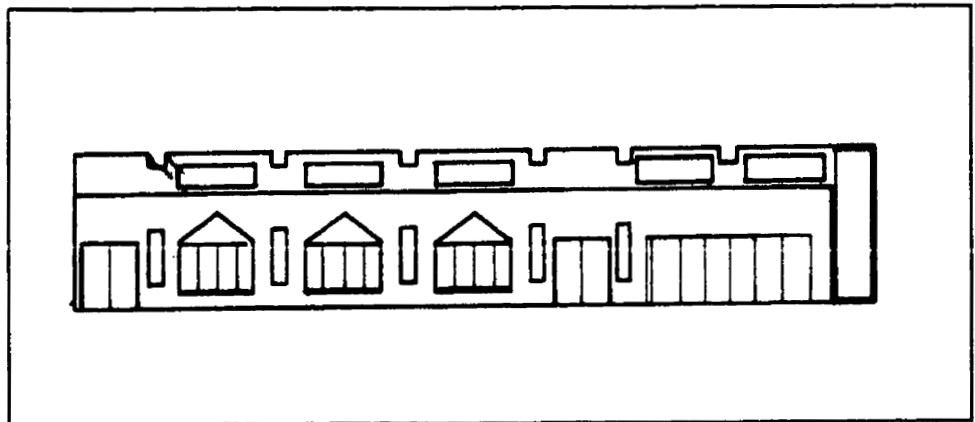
Worship space: Interior elevation of the south wall showing window and door openings, and storage doors.
